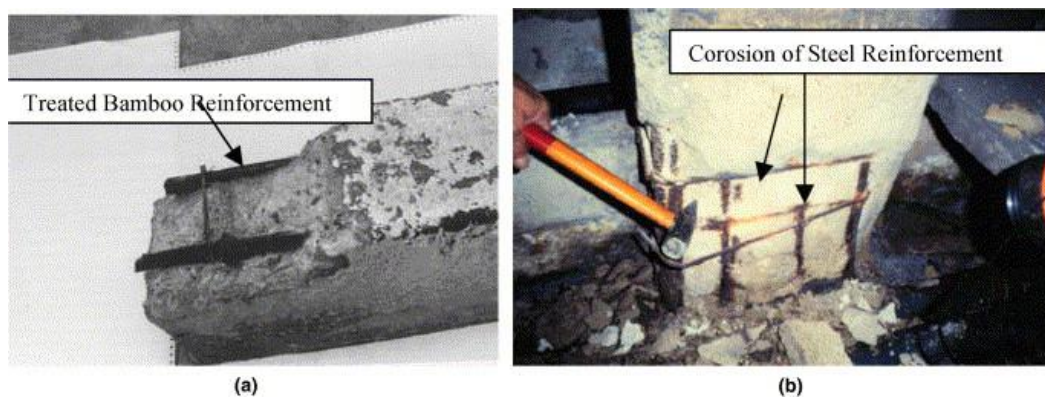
(a) Bamboo reinforcement of a tested beam exposed in open air after 15 years. (b) Steel reinforcement of a column in the tunnel of metro after 10 years in closed area. (Ghavami, 2005)
